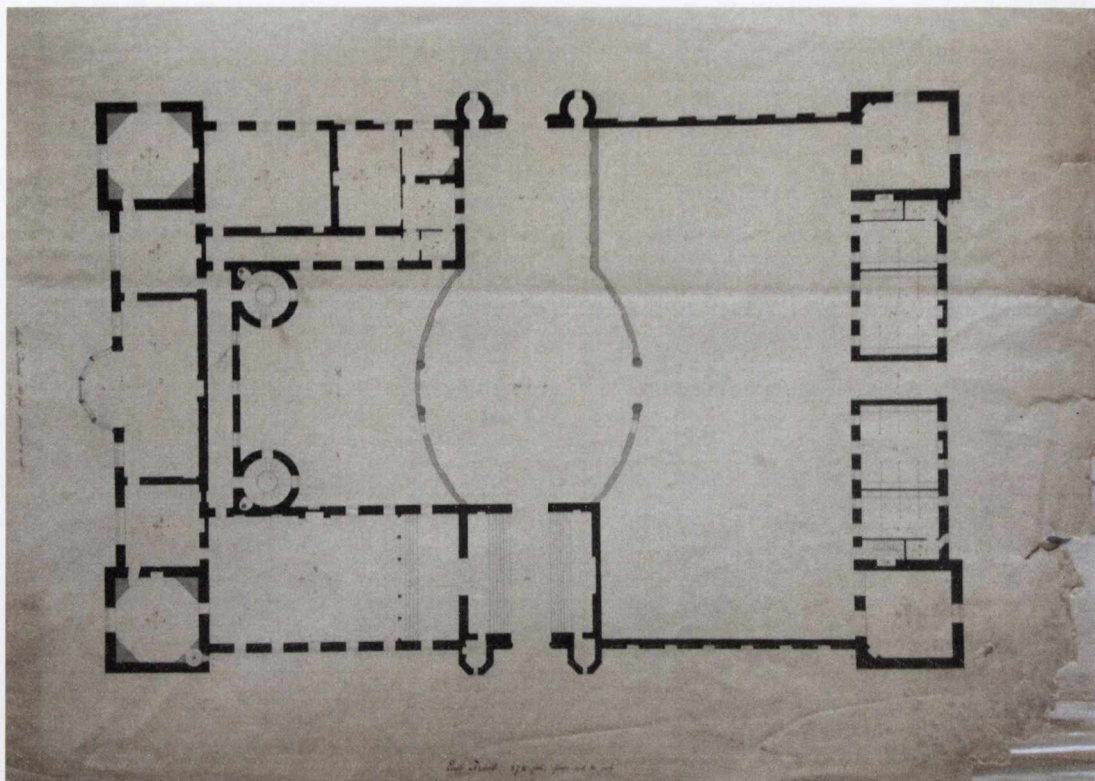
Proposed scheme for Charleville Castle, ground floor plan, John Pentland 1797, IAA, Charleville Forest Drawings Collection, 86/24/16, courtesy of the Irish Architectural Archive.
